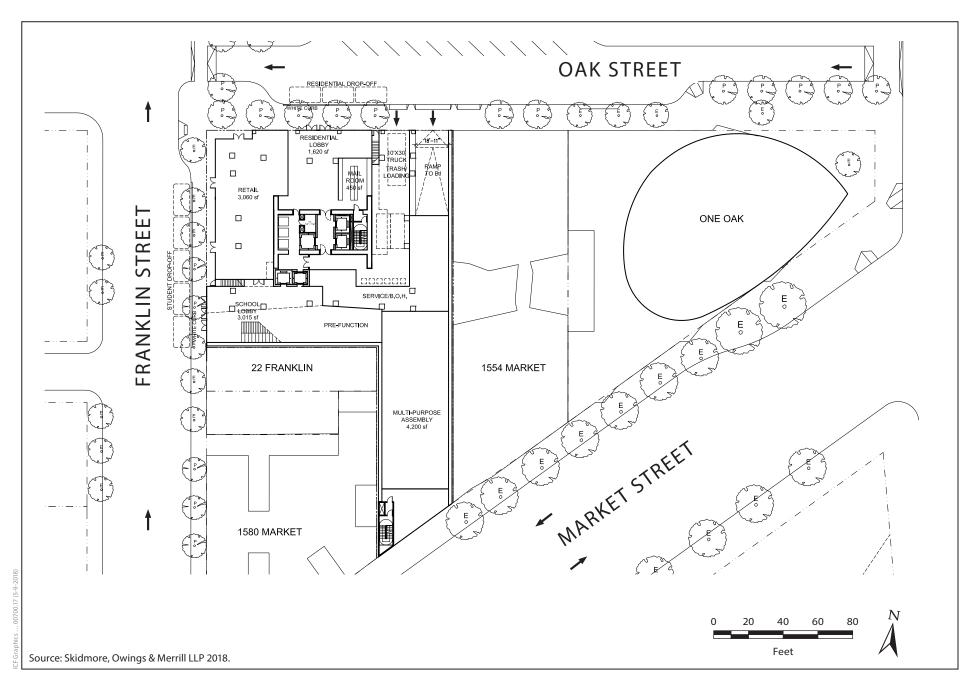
98 Franklin Street Project – Proposed Ground Floor Plan
